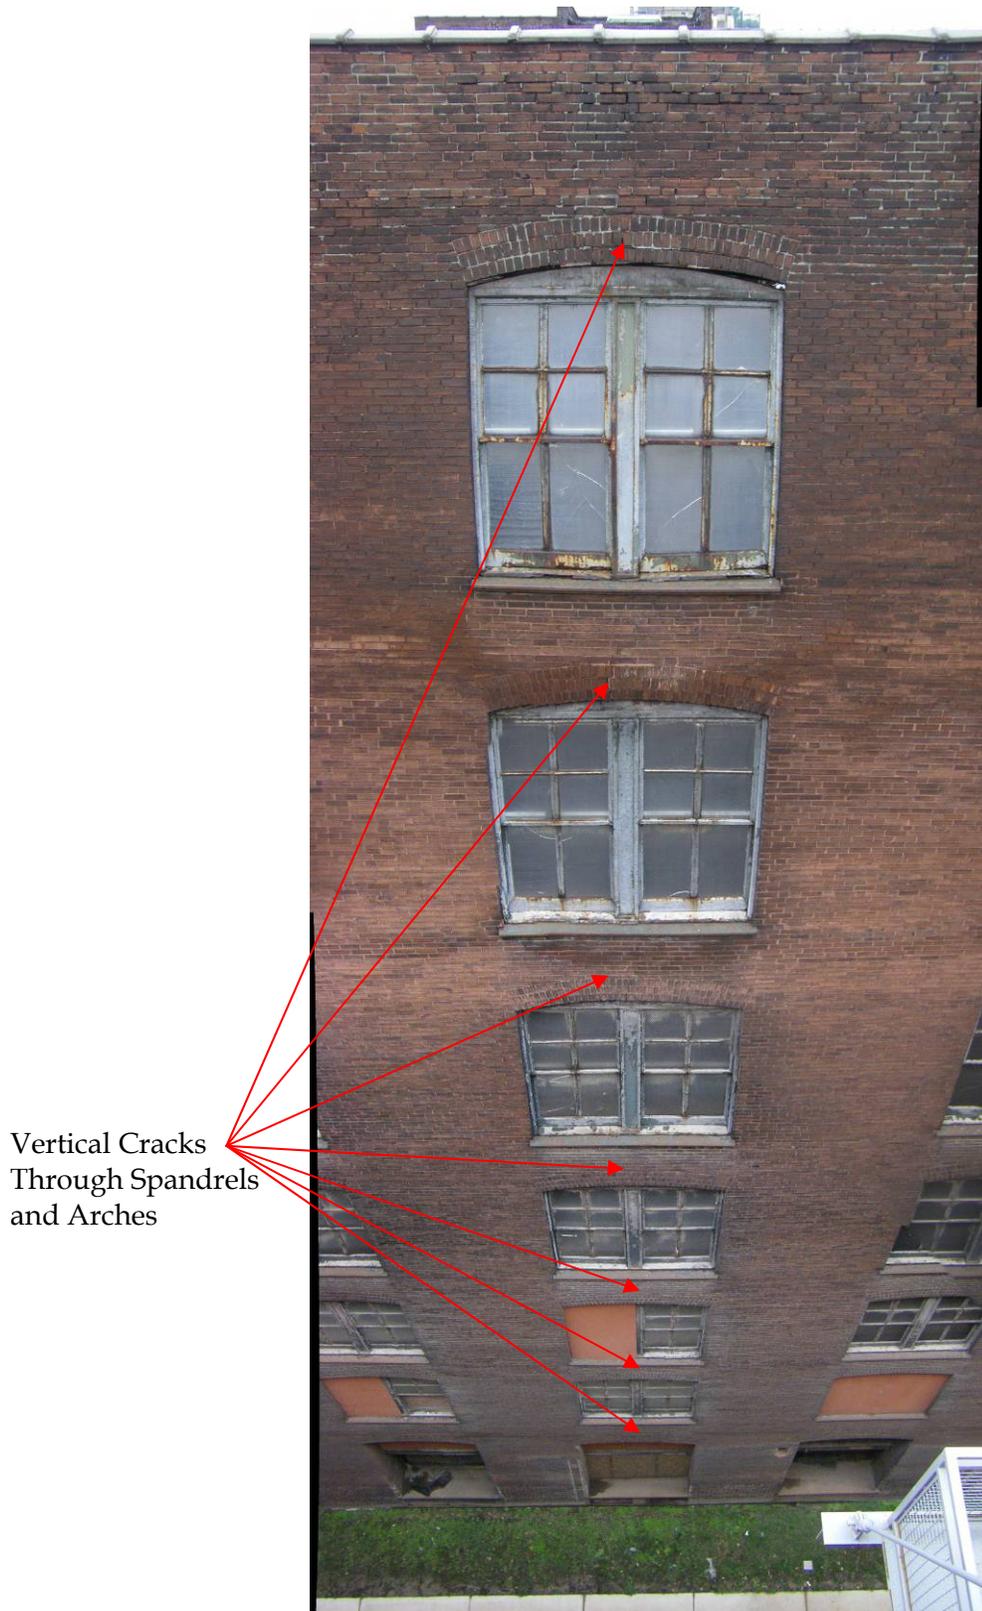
East Wall Vertical Crack Through Spandrels (composite imste)
